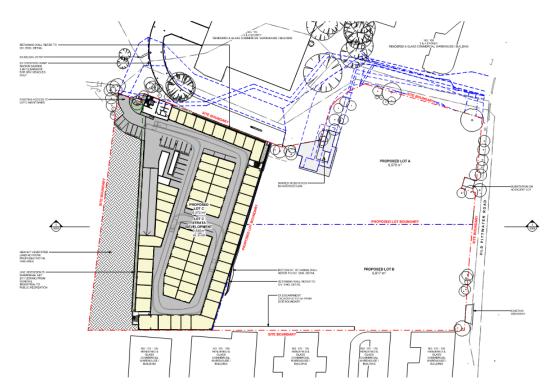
Proposed Site Plan (Source: Reid Campbell)
